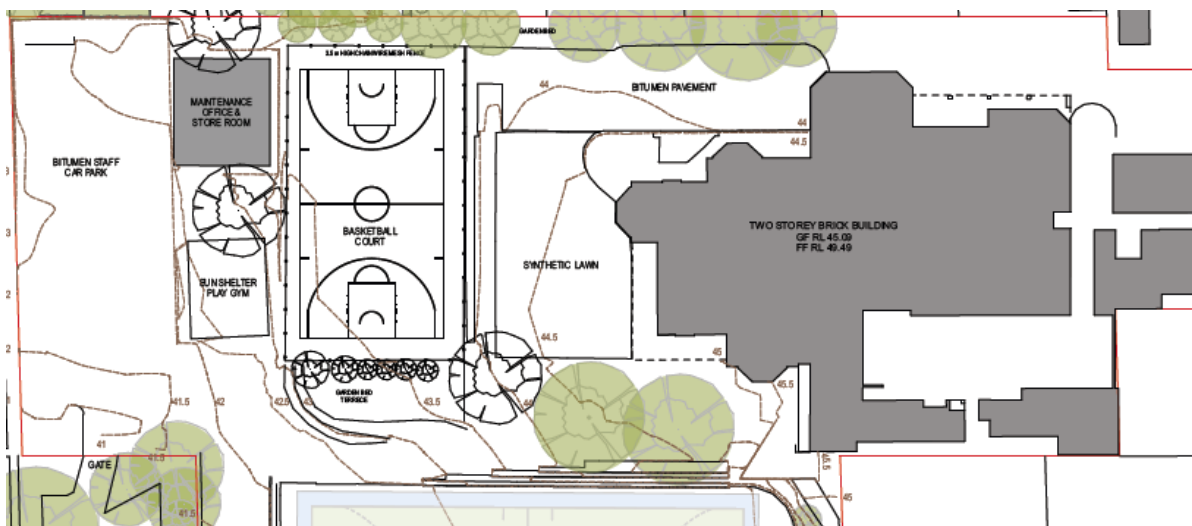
Existing conditions plan by Jackson Clements Burrows Pty Ltd Architects
